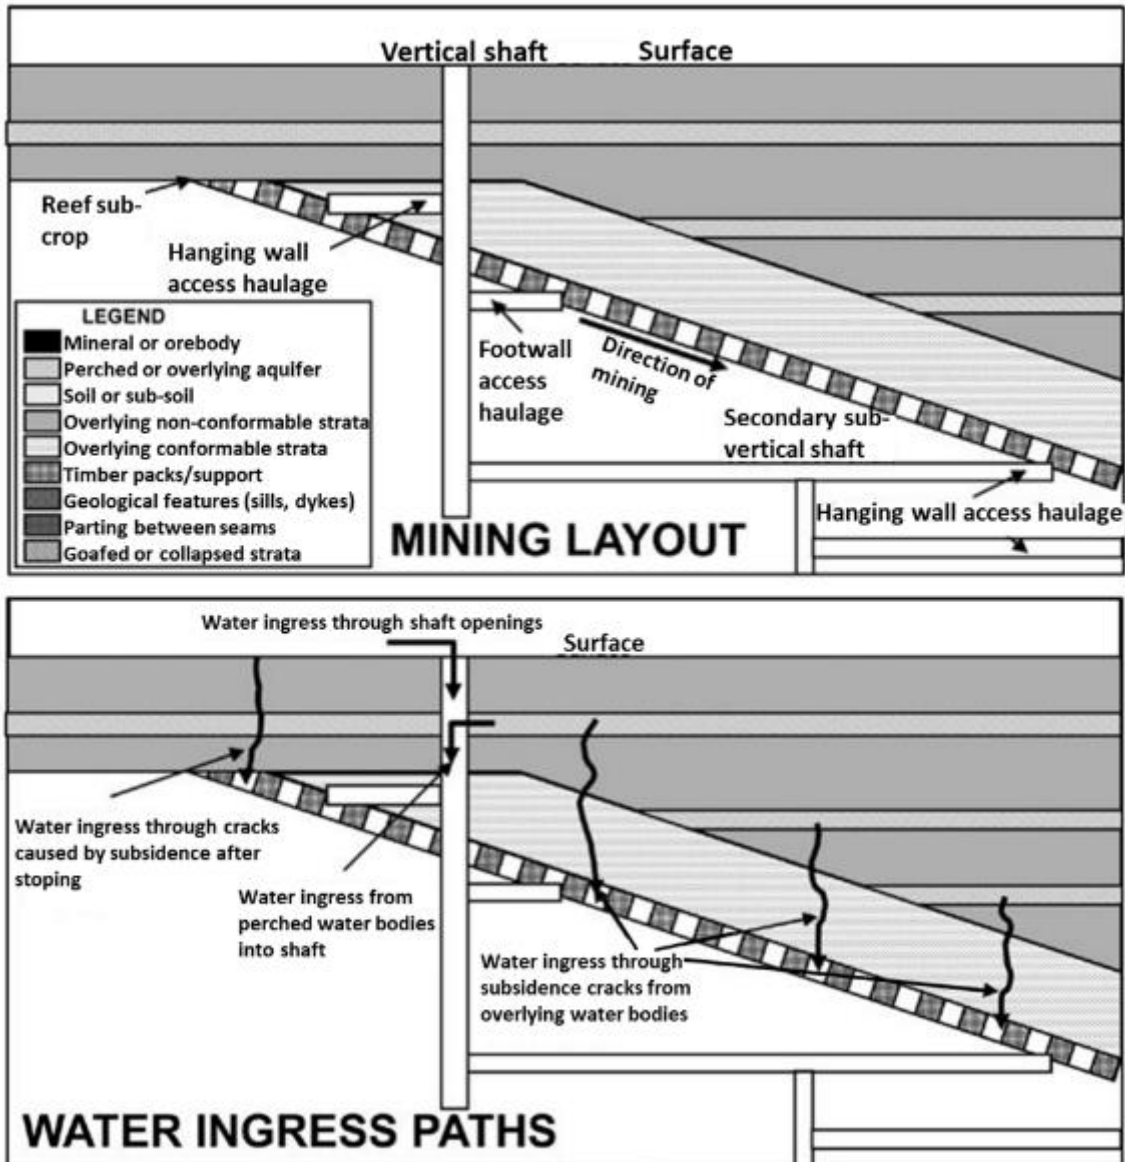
Cross-section through a typical deep reef mine showing water ingress through subsidence cracks from overlying water bodies (Source: DWAF, 2008)
